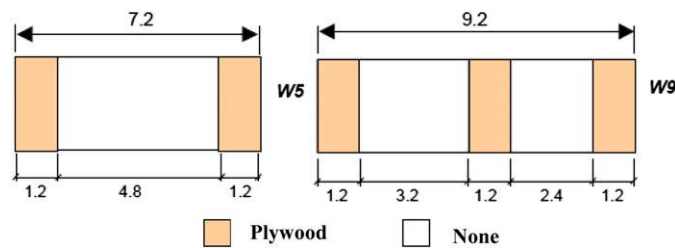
Plywood sheathing on exterior of Walls 5 and 9
